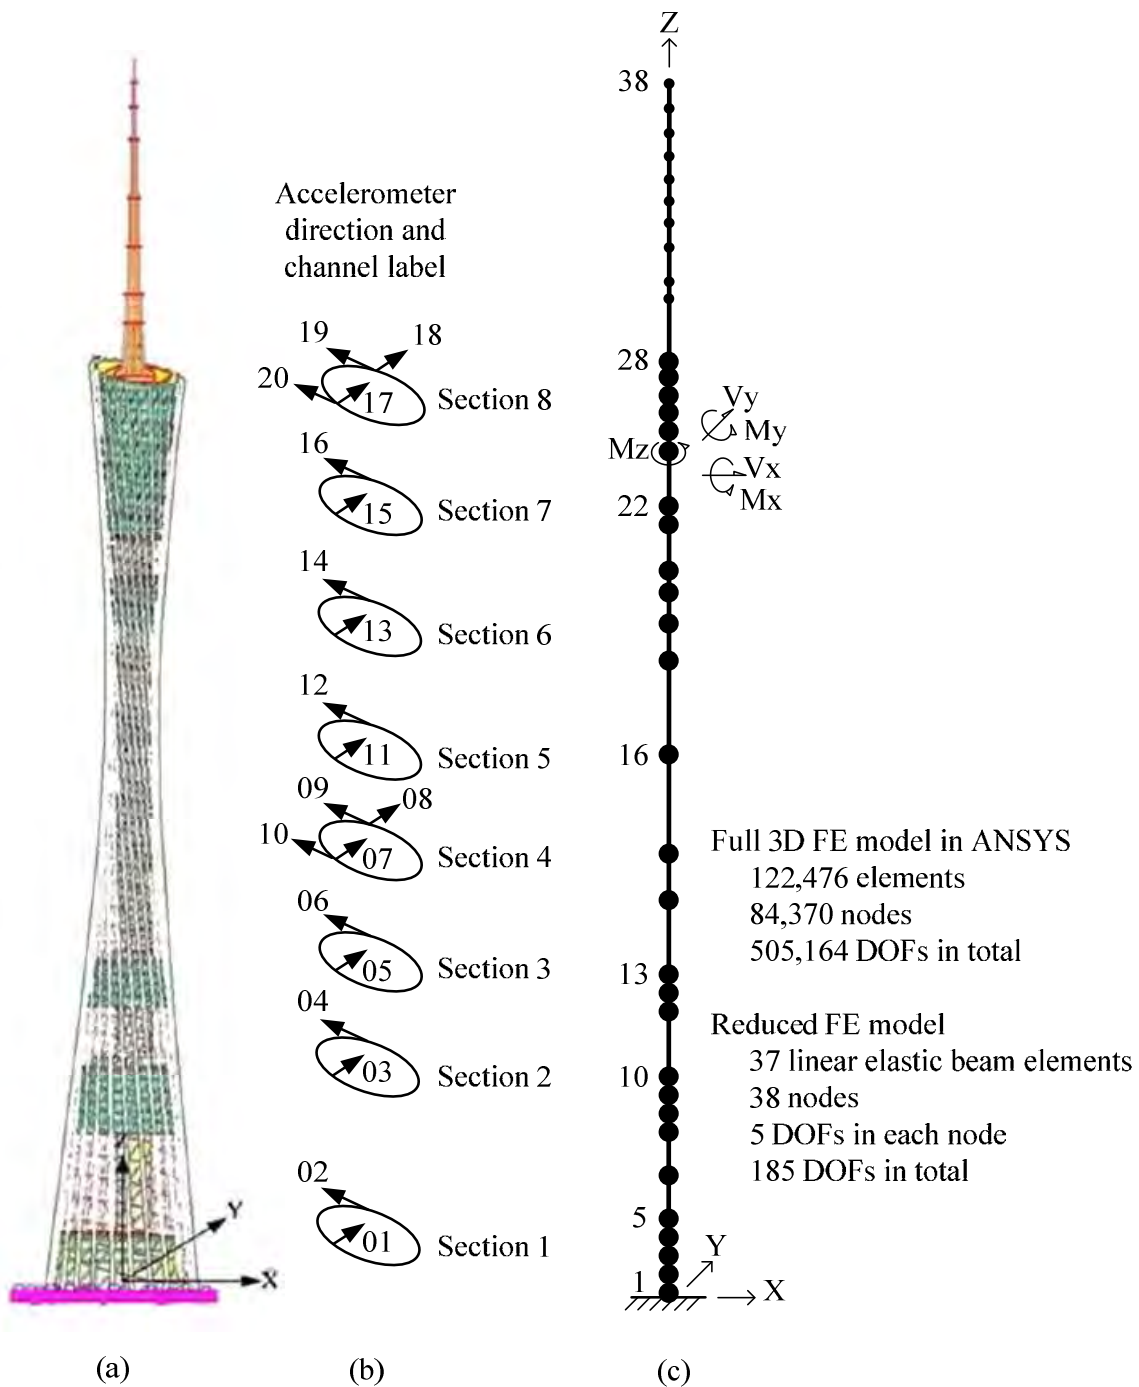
The Canton Tower; (a) Finite element model of Canton Tower; (b) Positions of installed accelerometers; (c) Reduced finite element model
